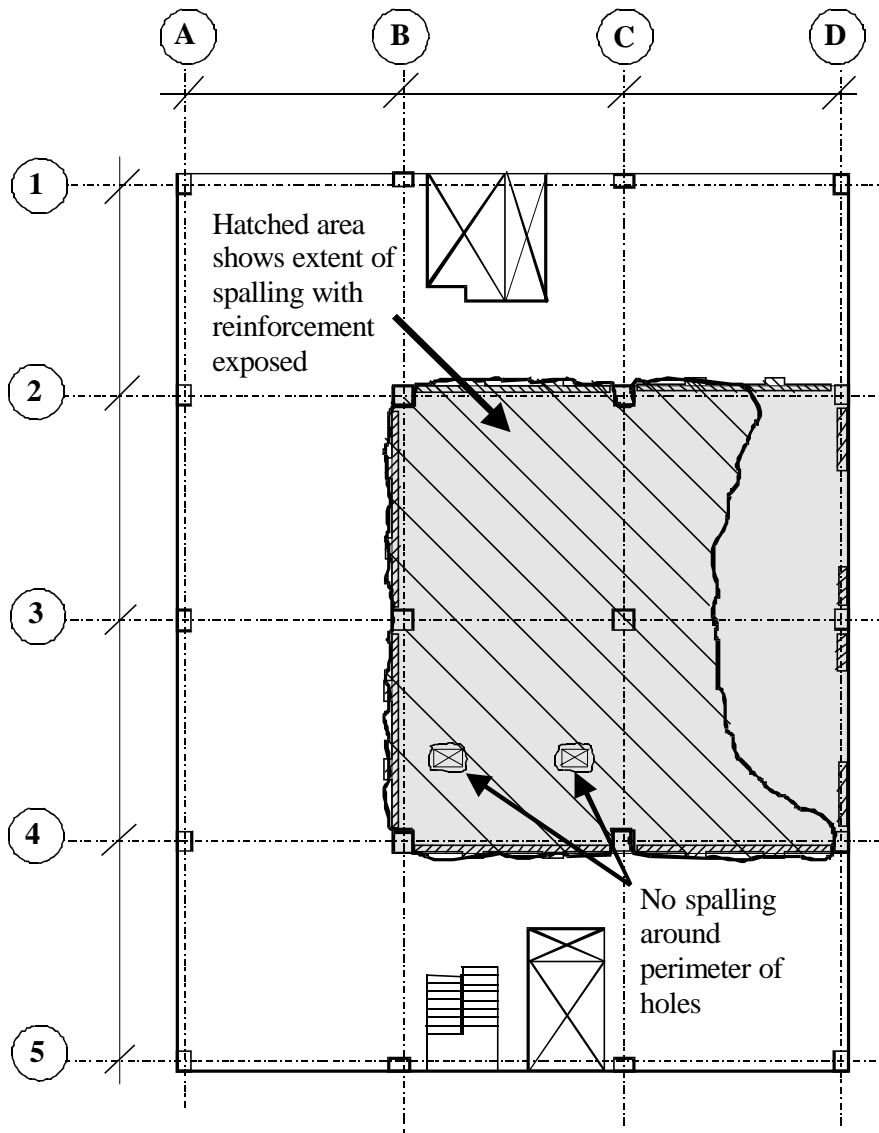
Extent of the spalling exposing bottom reinforcement in the slab.
